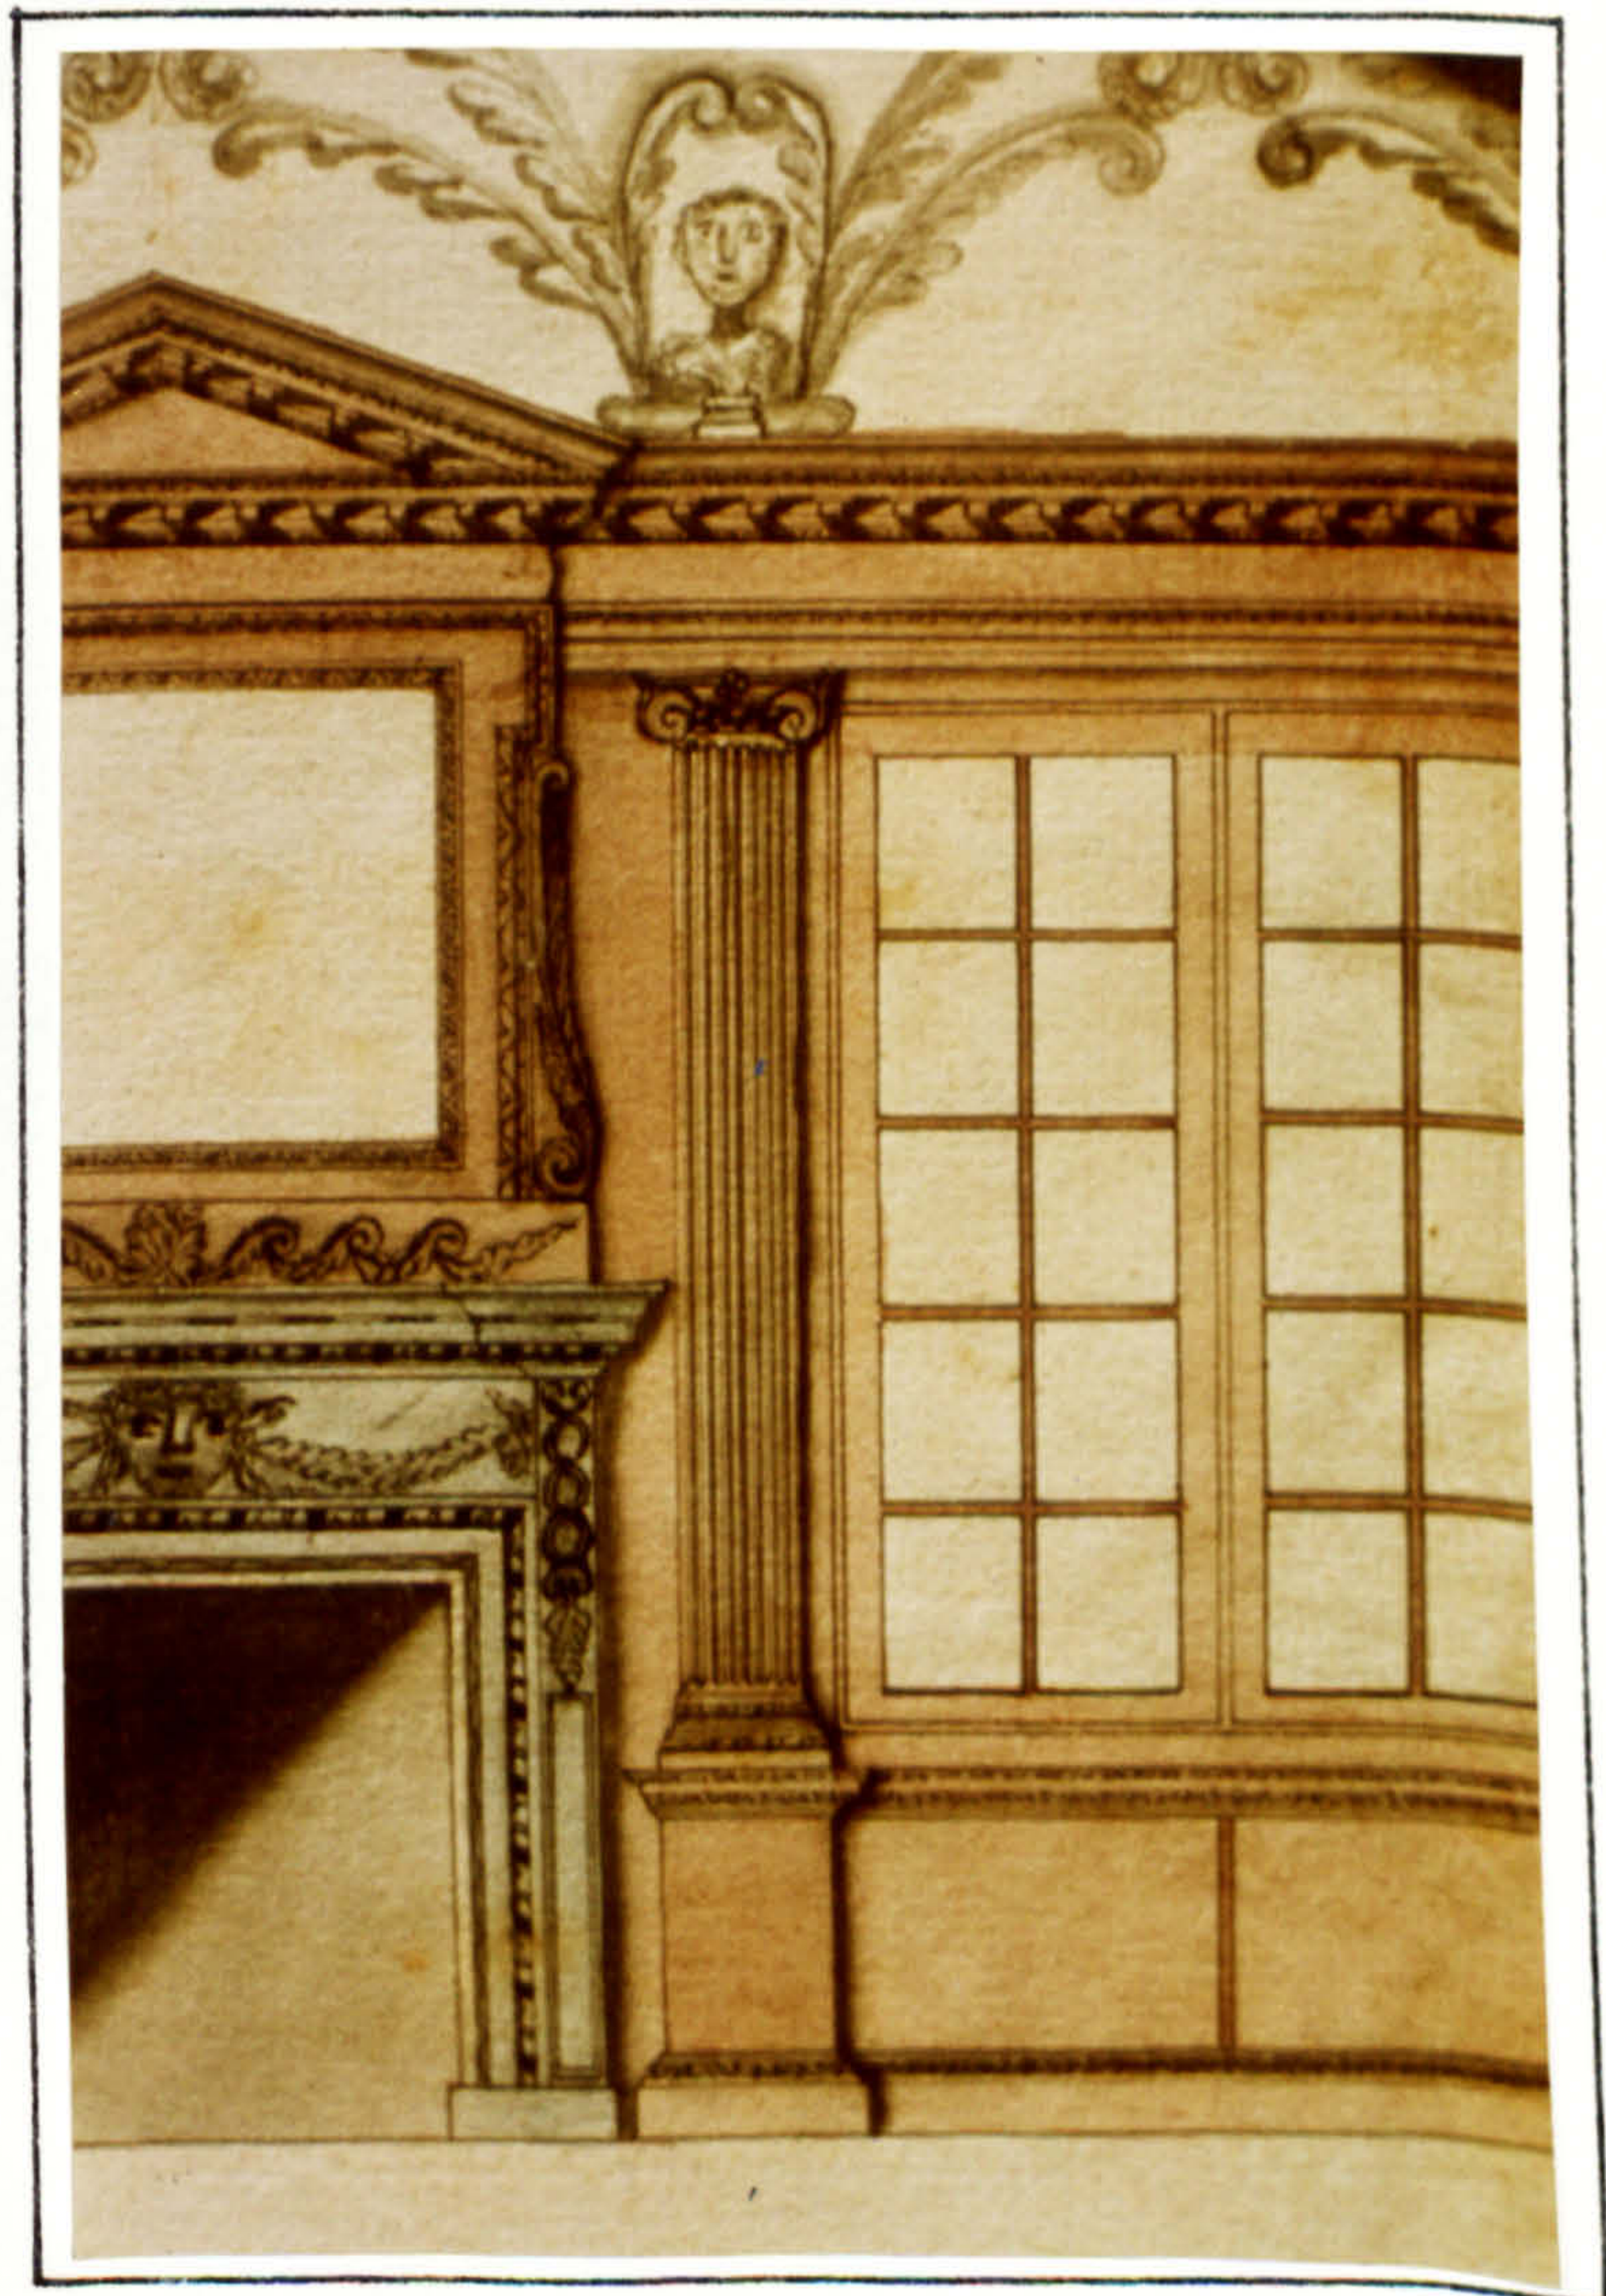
DETAIL OF CHIMNEY ELEVATION FOR THE SAME ROOM
